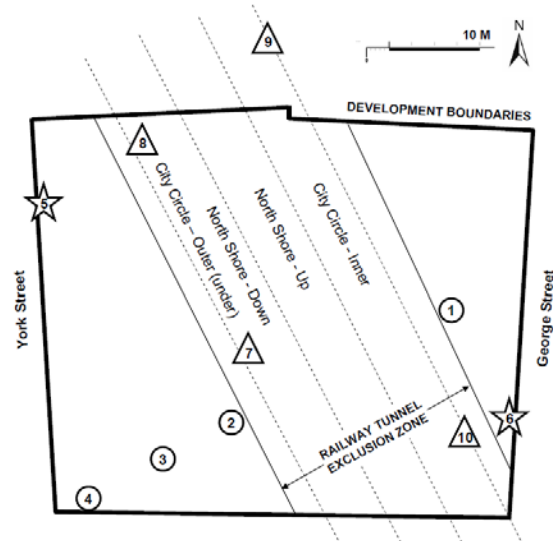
Site plan indicating train vibration measurement locations. Legend: ○ Surface ☆ Retaining walls △ In-tunnel
